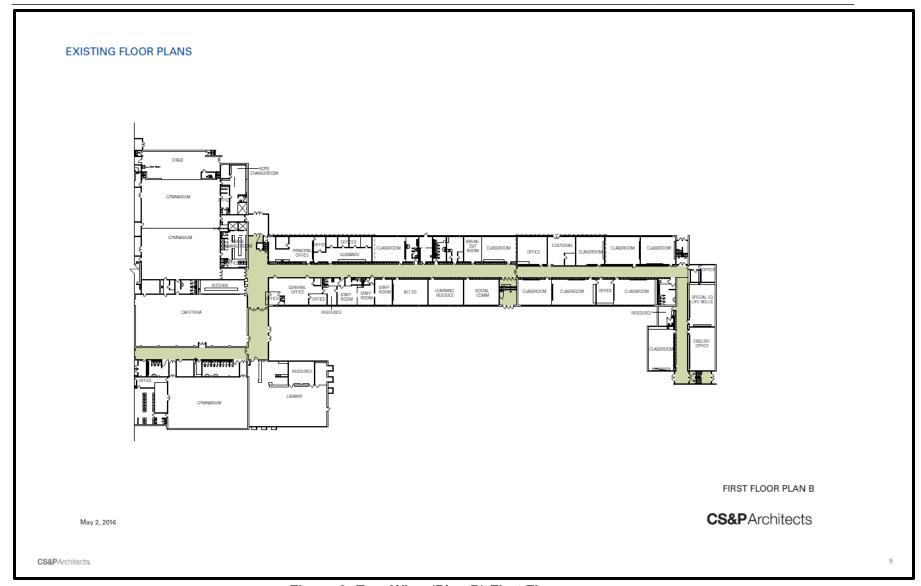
East Wing (Plan B) First Floor (CS&P Architects 2016:5)
